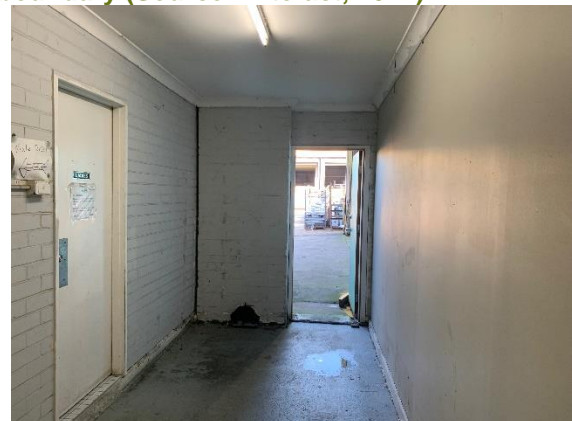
Interior corridor, with opening onto 28 Burrows Road. (Source: Artefact, 2022)
